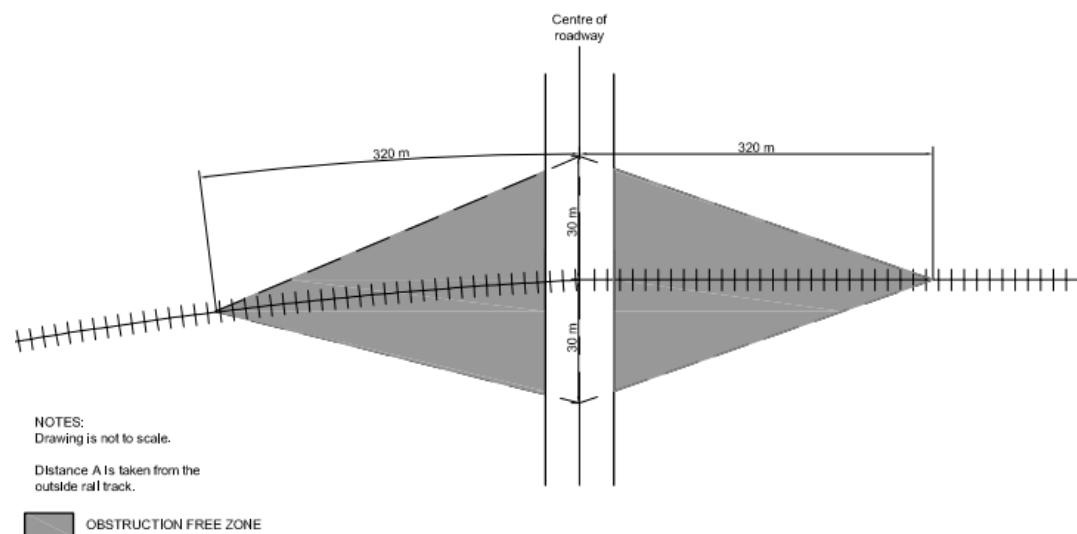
Approach sight triangles for level crossings with “Give Way” signs
